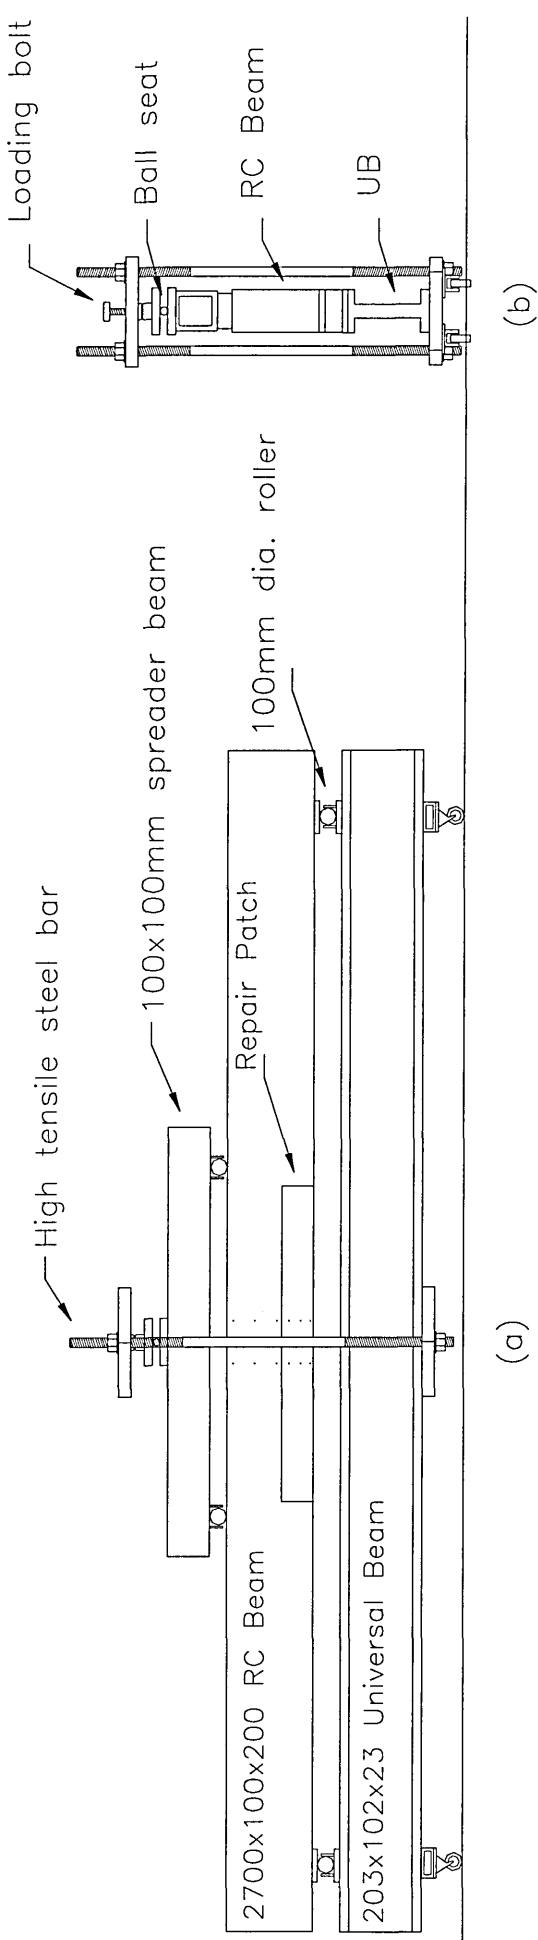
Repaired reinforced concrete beam under load: (a) elevation and (b) end view
